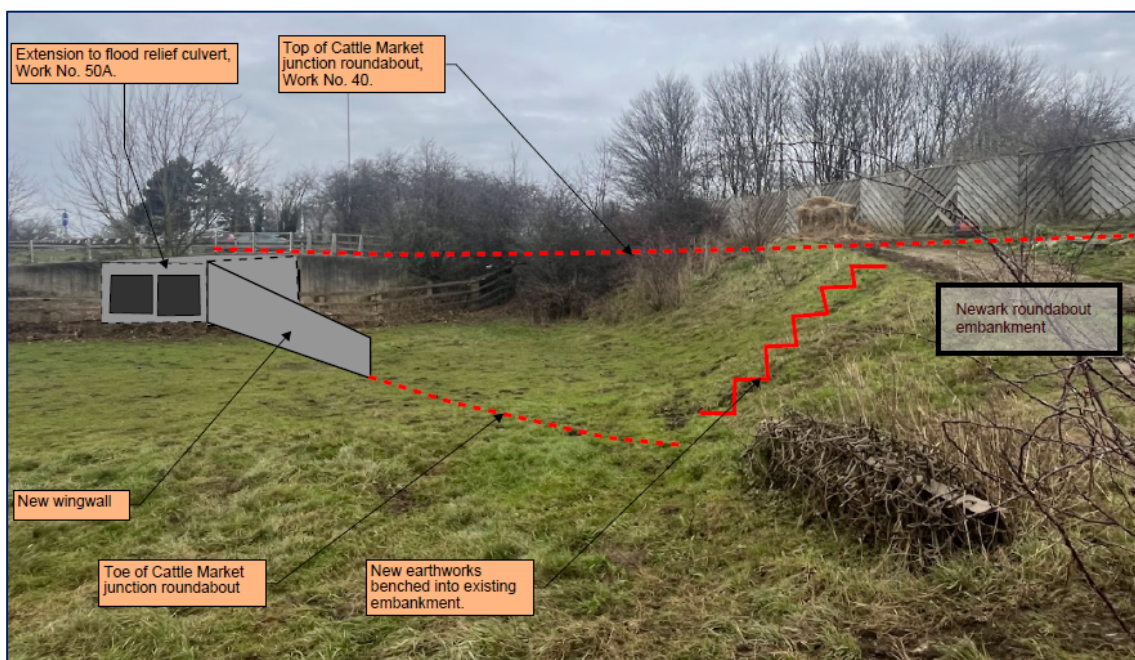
Location of interface between Scheme and Newark roundabout embankment
